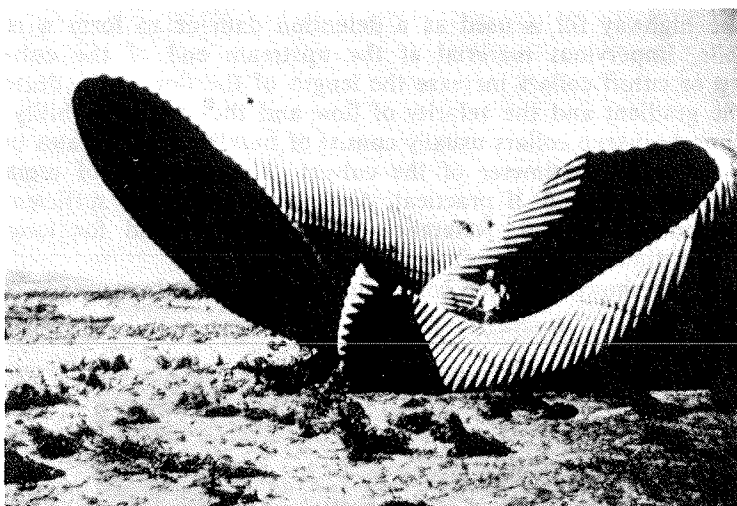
Damage to culvert inlets from hydraulic forces and drift.
